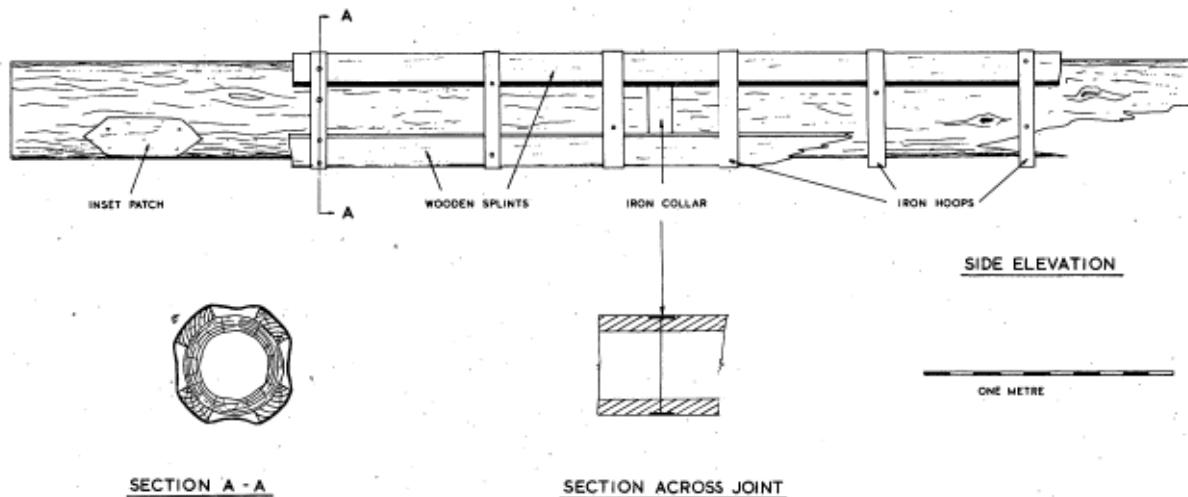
Wooden Pipe found at Ravensbury Park, Mitcham.
